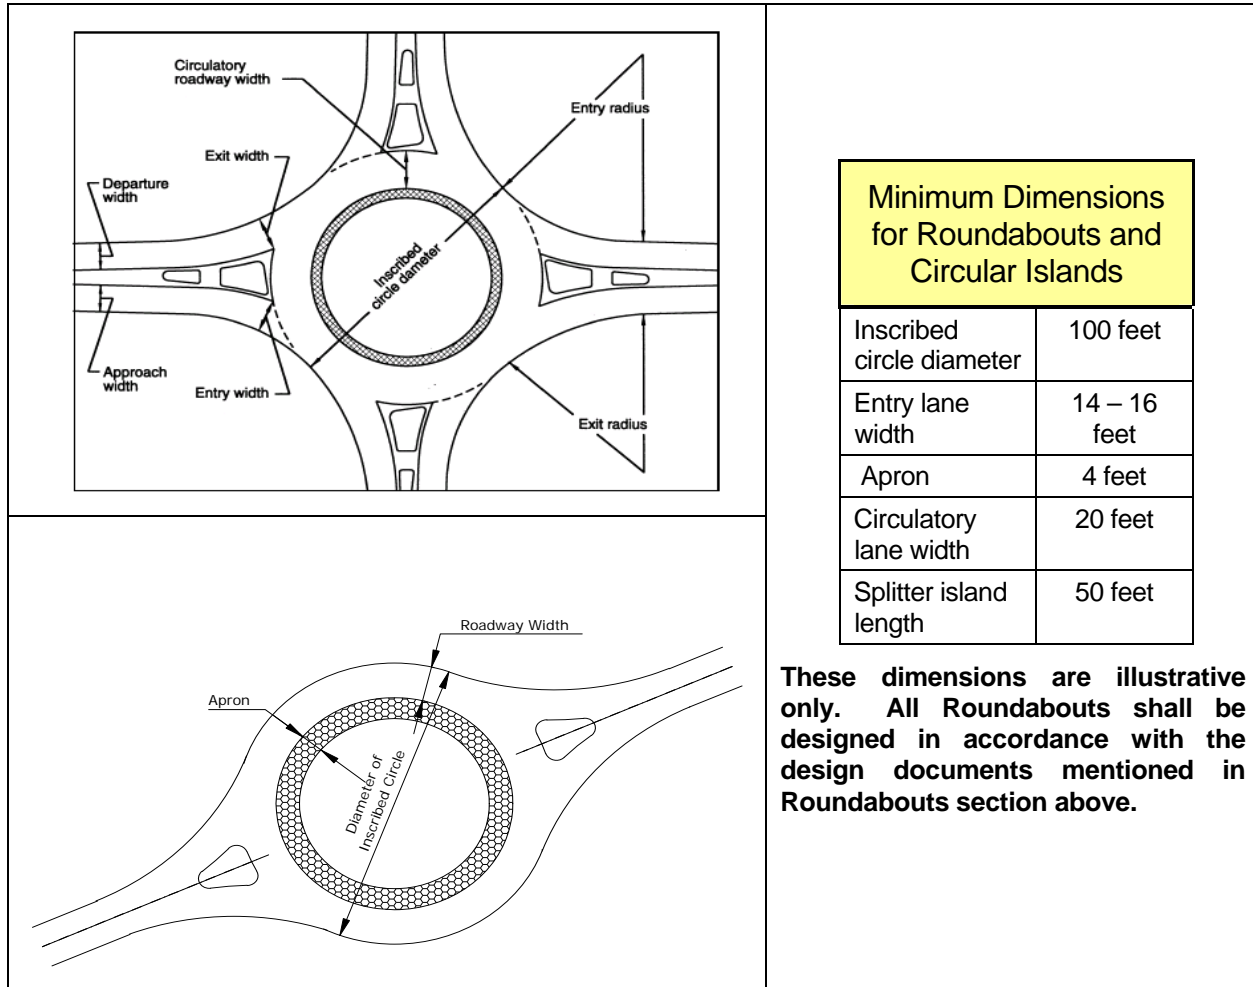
ROUNDABOUT DETAILS
